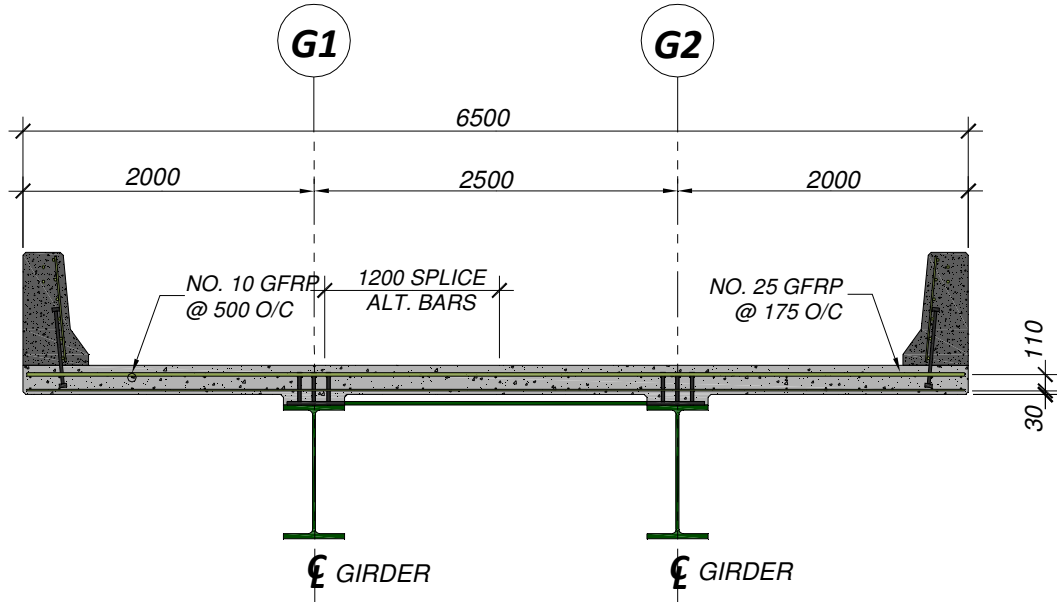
(d): Typical cross section illustrating the top reinforcement details for section with GFRP reinforcement (Cross section “D” from Figure 3-9(a))
